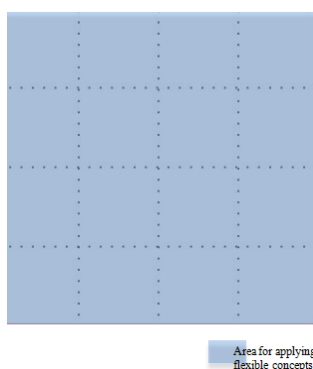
Open floor layout most adequate base for applying flexible concepts.
